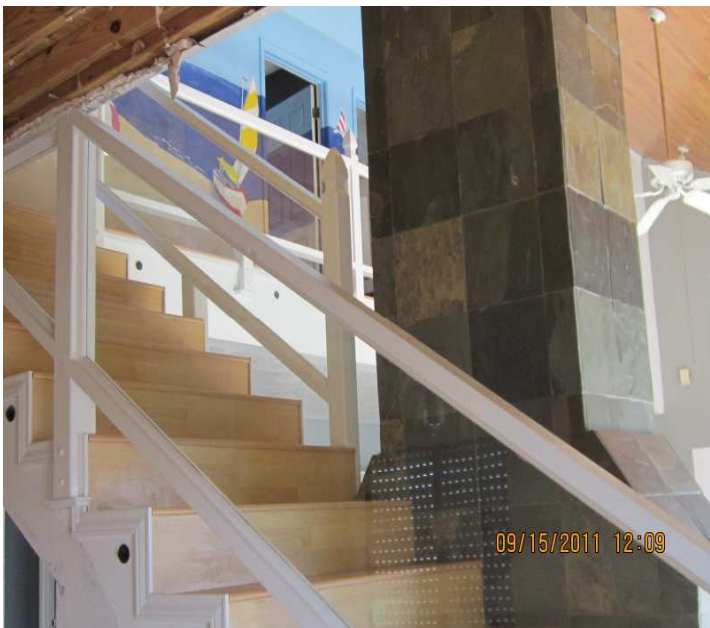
OPEN ELECTRICAL JUNCTION
